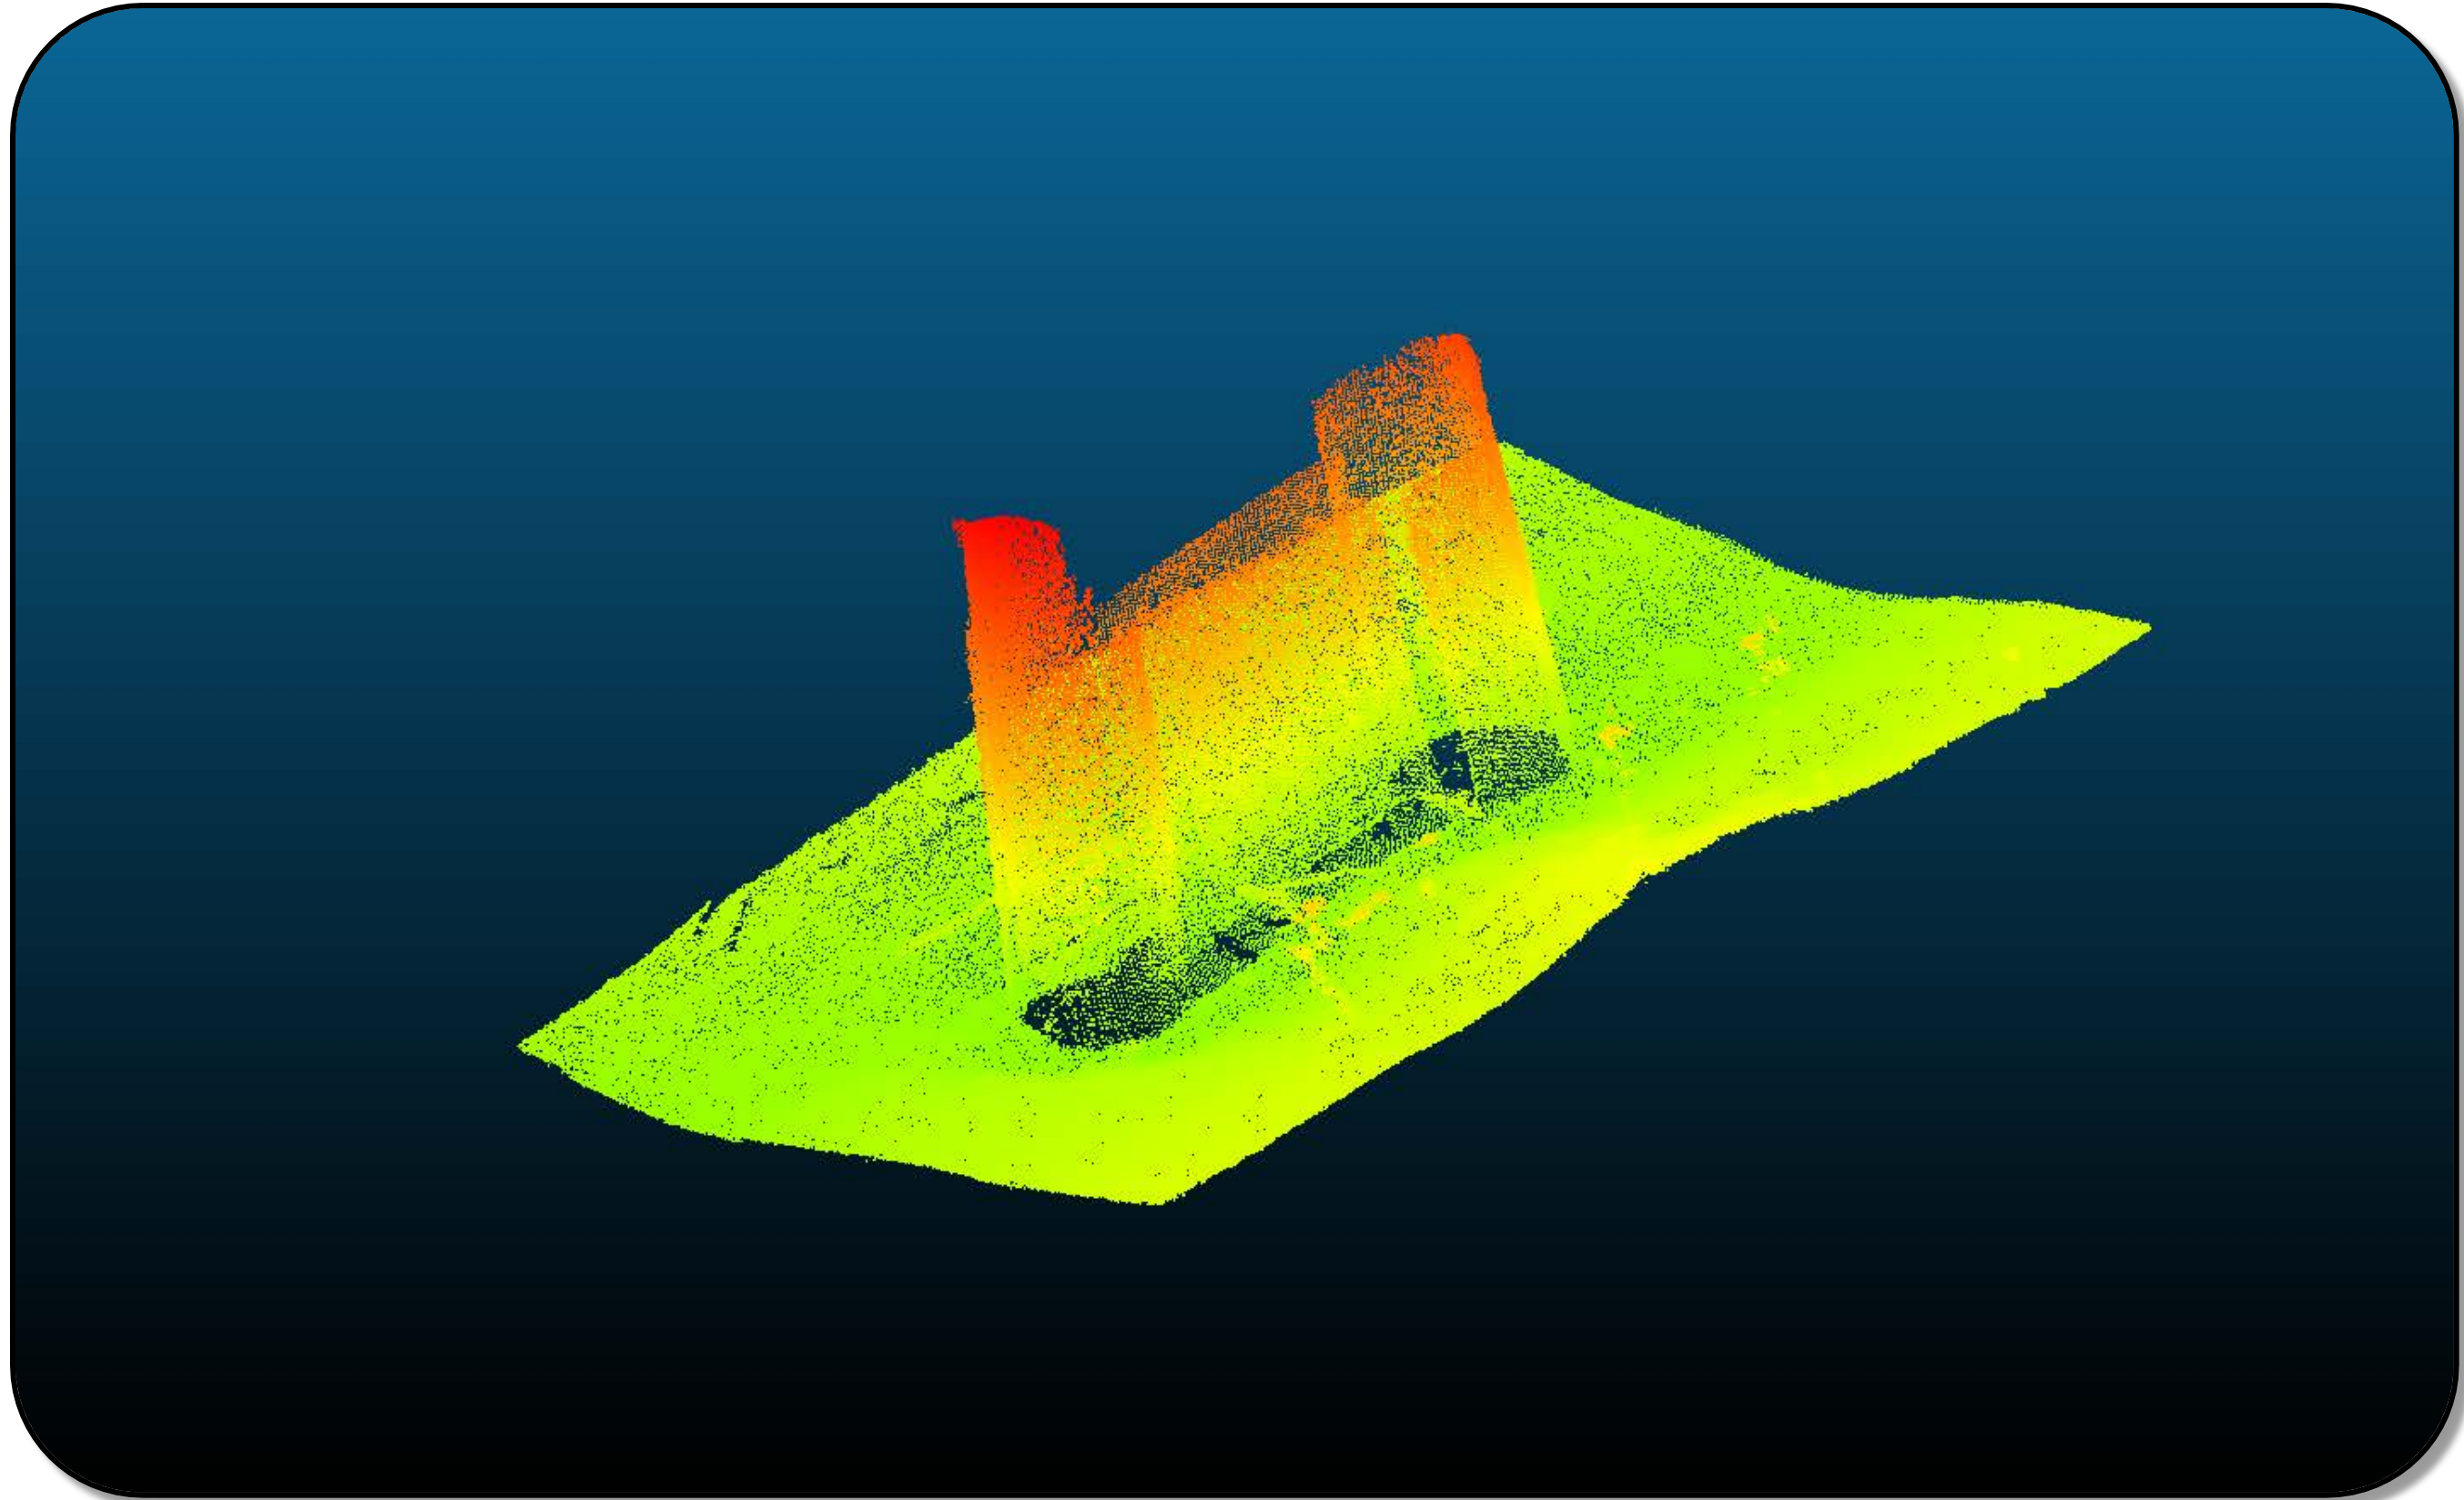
Perspective view of Pier 16 point cloud (looking from the northeast direction).
